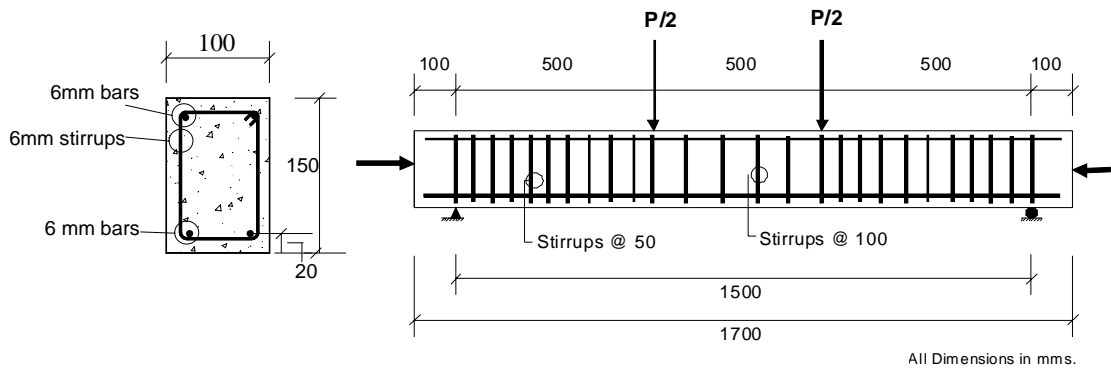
Test specimen and loading configuration for combining axial compression & flexure
